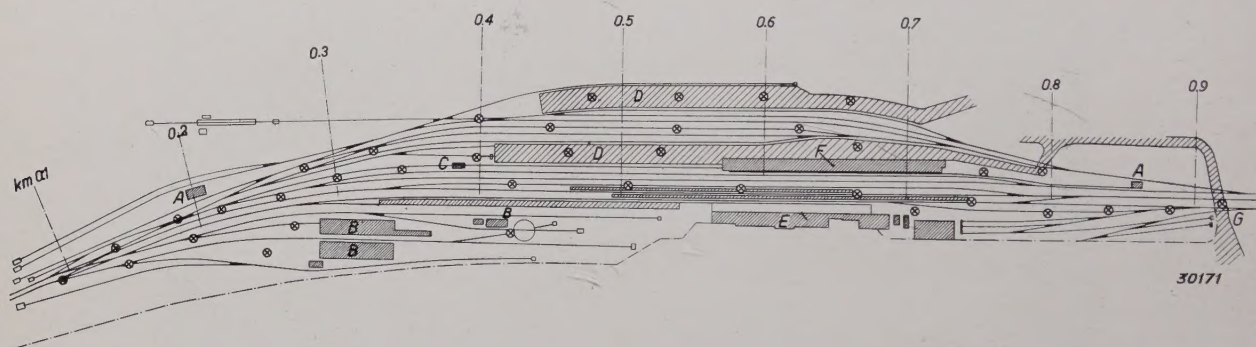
Ground plan of the railway yard in Breda. A signal box, B work shops, C weighing cabin, D unloading yard, E station building, F goods shed, G level crossing.
